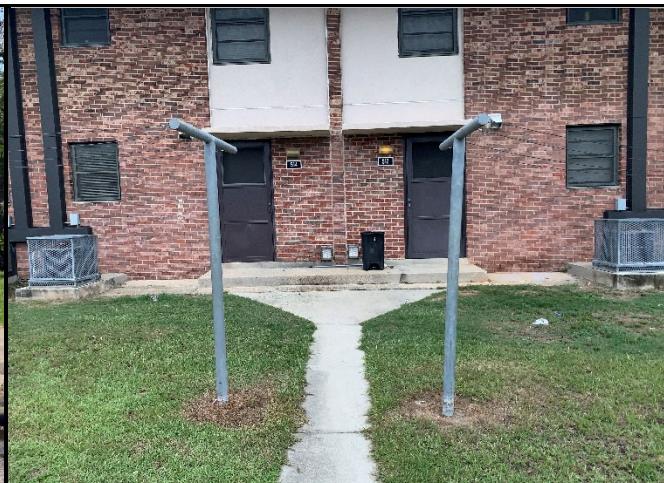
Example of poor sidewalks (inadequate width and drainage) and unused laundry line poles
